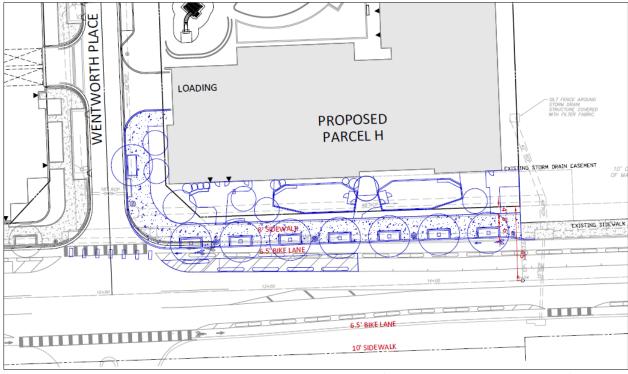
Proposed Marinelli Road Frontage Improvements (hatched area will be a raised curb)
